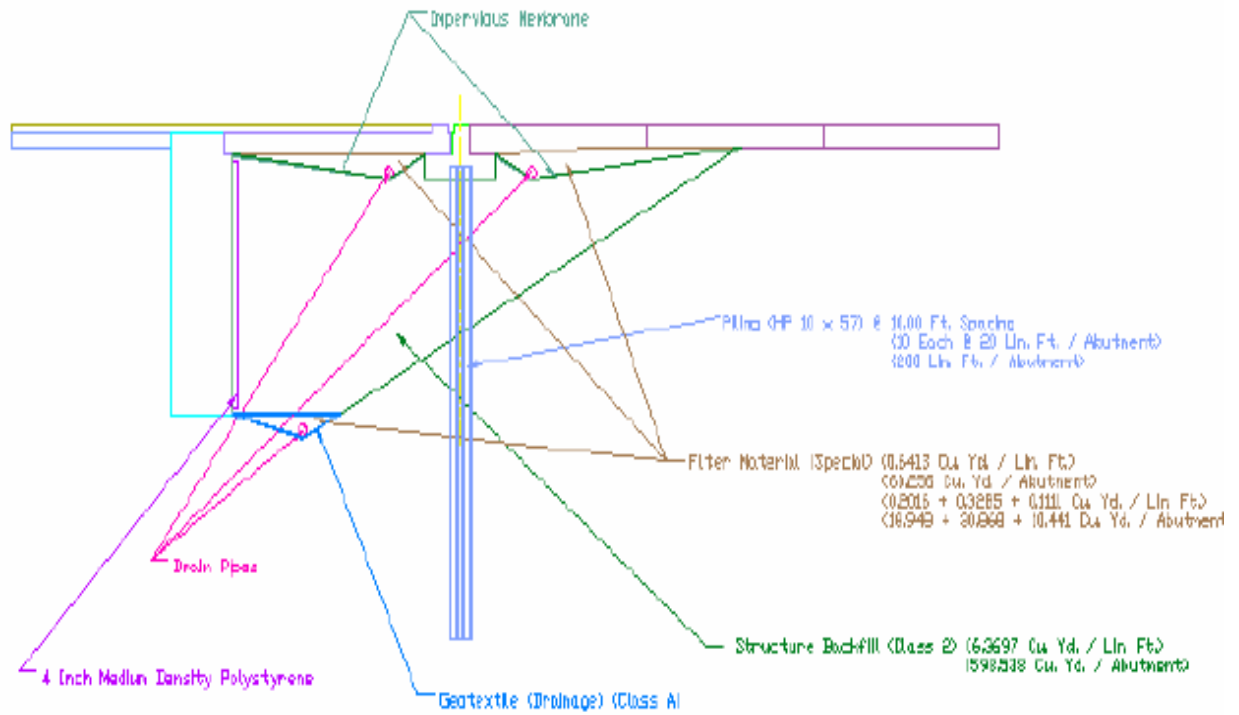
The Driven Pile System Proposed for the 120th Project Bridge Approaches.
